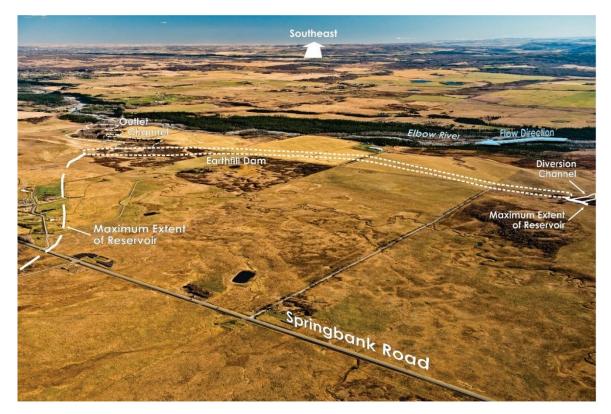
Looking Southeast towards Off-Stream Storage Reservoir and Dam
